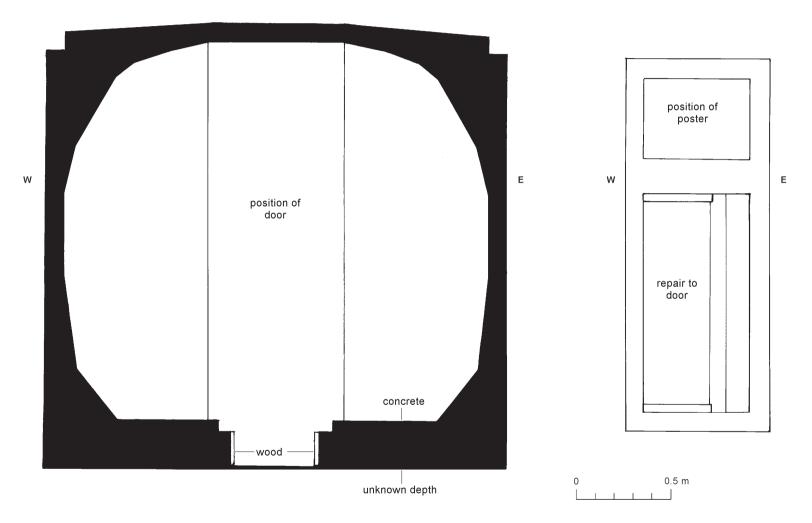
Air-raid shelter 1: interior face of entrance (left) and door (right).
